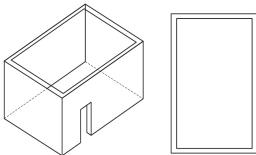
Outdoor Area Example 1 Walls on all sides, one permanent opening
